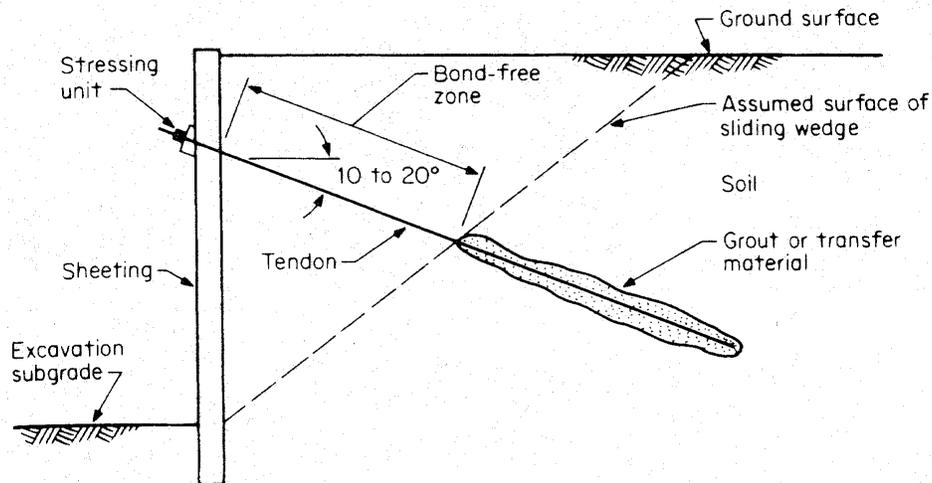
Tieback installed at 10 to 20° down from horizontal
